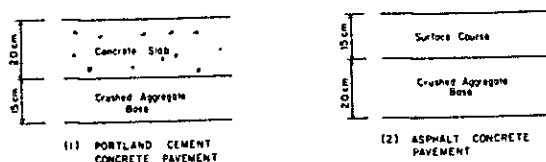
TYPICAL PAVEMENT STRUCTURES IN PANAMA
